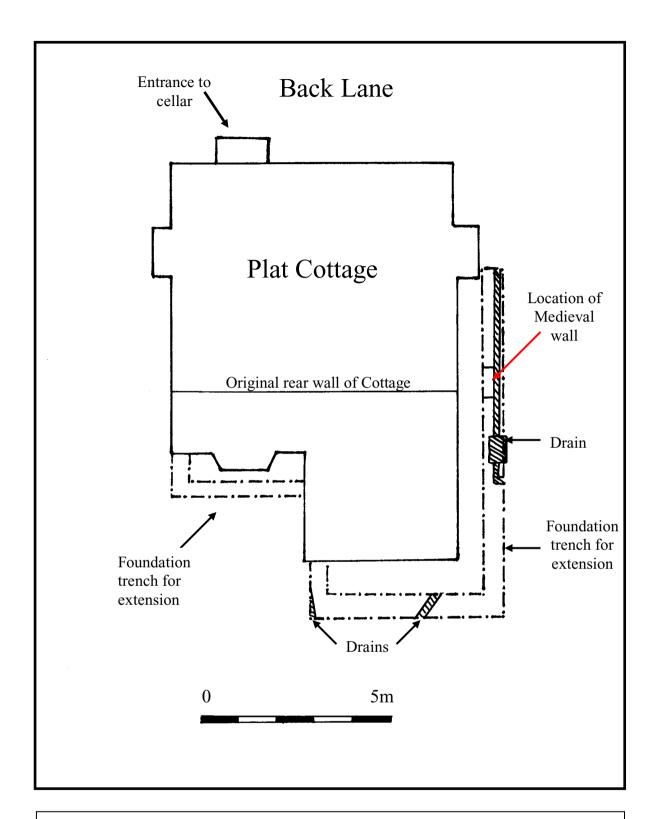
Plat Cottage, Winchelsea: Site Plan showing location of extension, the Medieval wall and entrance to the cellar.
